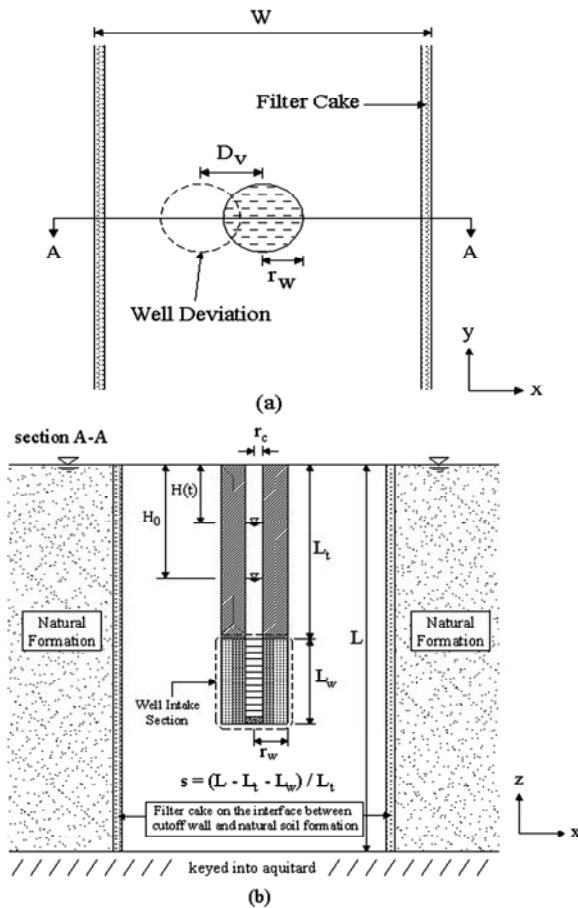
Slug test configuration in vertical cutoff wall: (a) Plan view and (b) vertical cross section A-A and the locations of filter cakes
